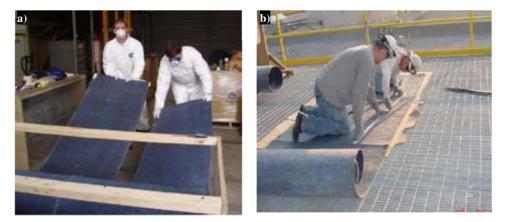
Typical technology of insulation with aerogel: a) storage in rolls; b) installation and fixing with staples
